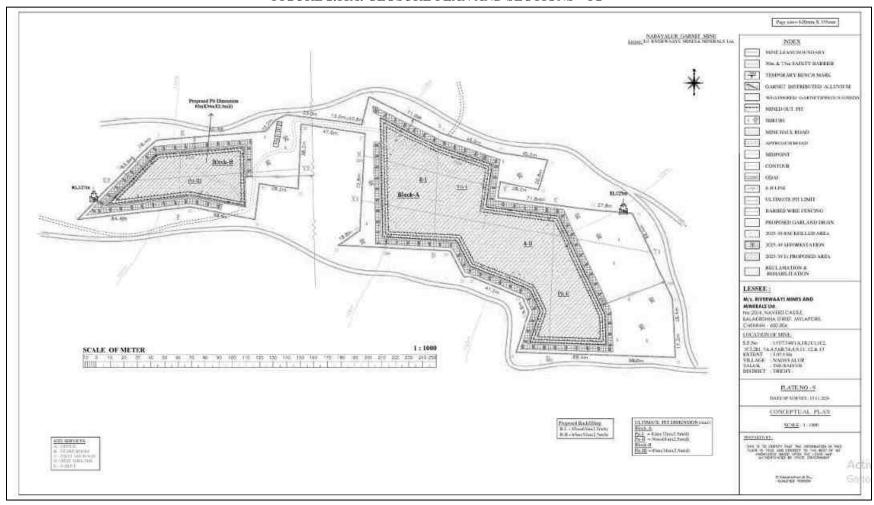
CLOSURE PLAN AND SECTIONS - P1
